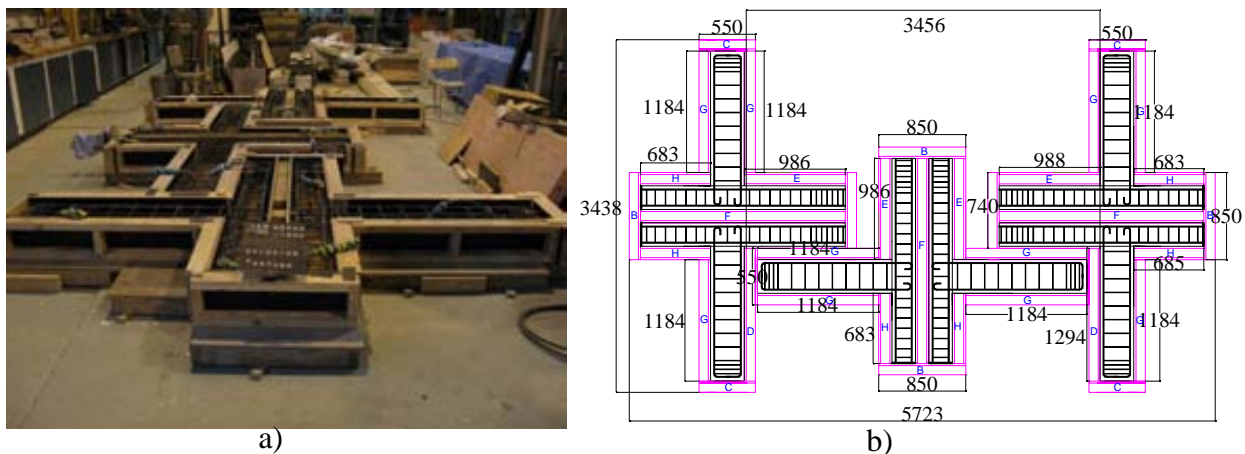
a) 2D specimens without slab – ready for casting; b) Formworks for 2D specimens without slab.
